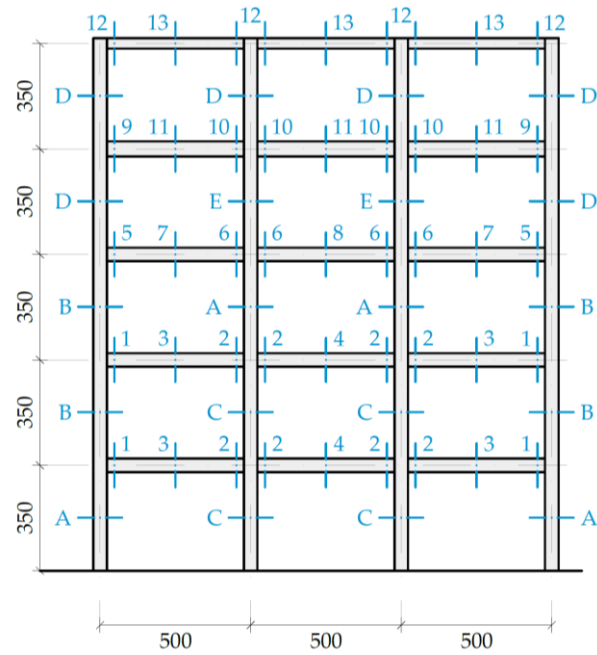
Indication of the main sections of beams and columns of frame "DCM\_2".
